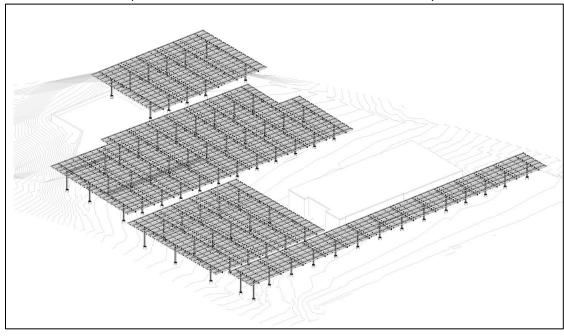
Isometric view of solar canopies in relation to site topography and existing building
